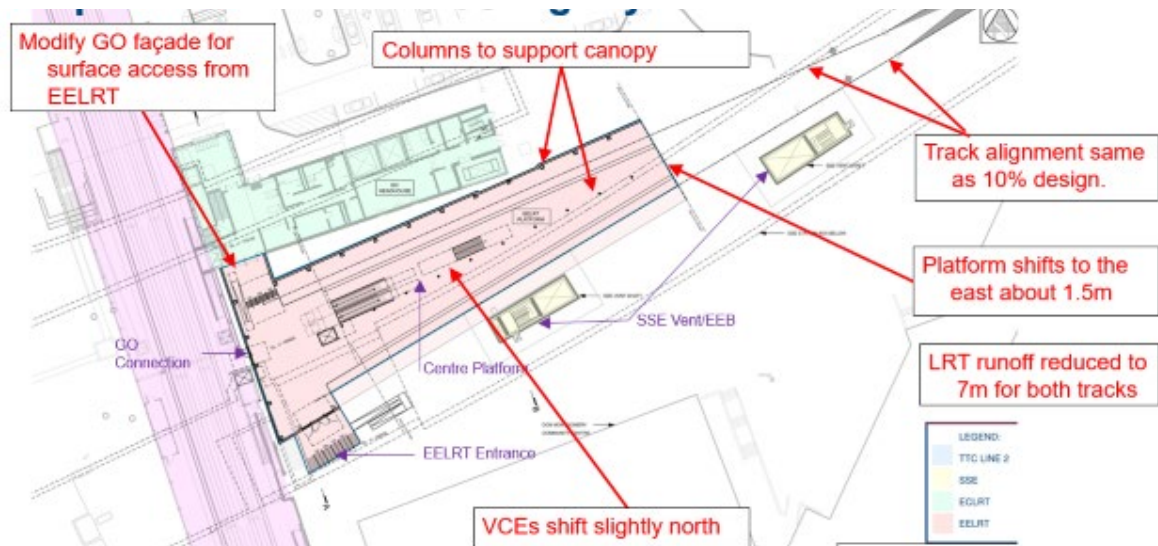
Concept plan for EELRT Kennedy Station Alternative Design (Option 2)
